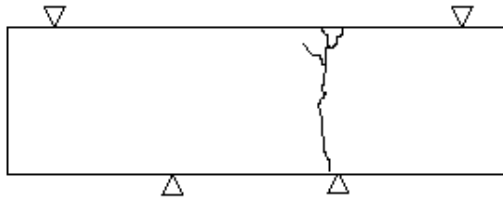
Typical cracking and failure modes of beams reinforced with Tyfo® carbon for shear at 45°.
